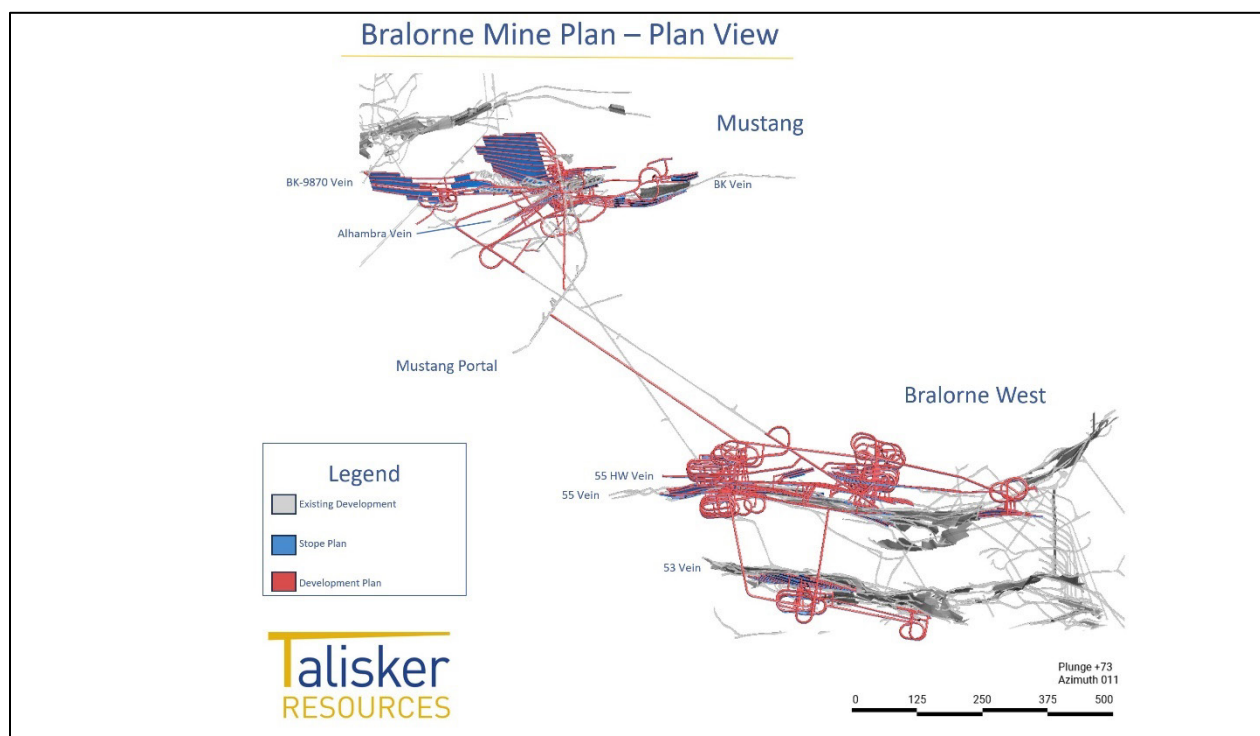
Plan view of Mustang Mine production plan 2025 through 2029.
